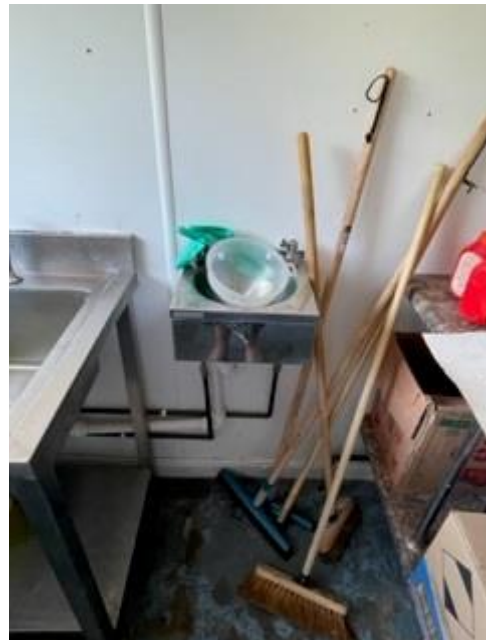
Dirty wash basin area – poorly fitted cladding which traps dirt.
